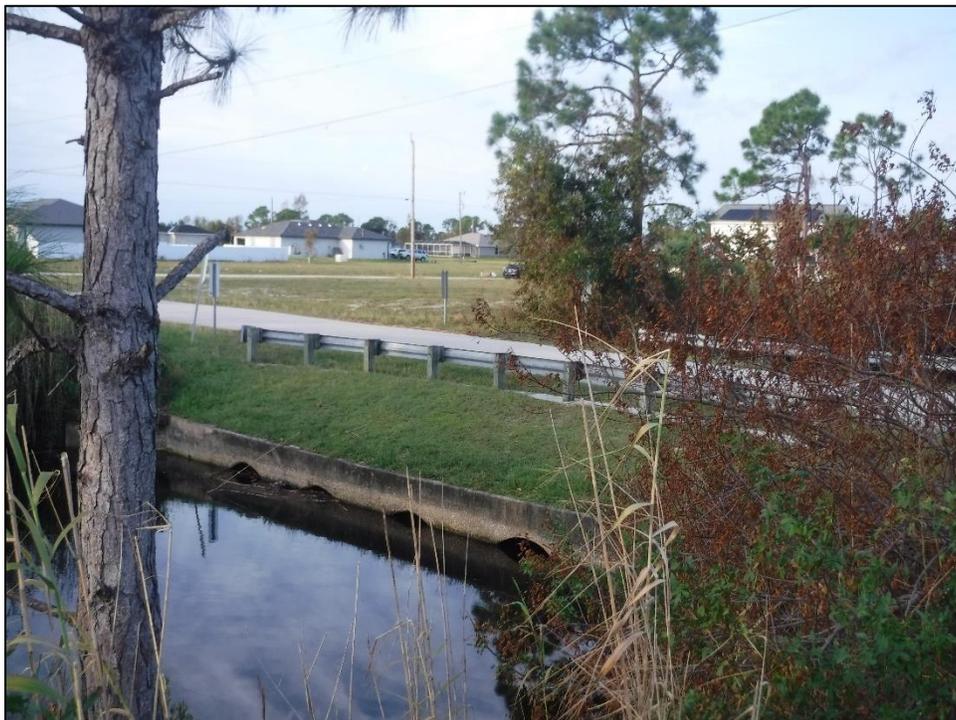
Bridge No. 125205/8LL3071, facing Southwest
